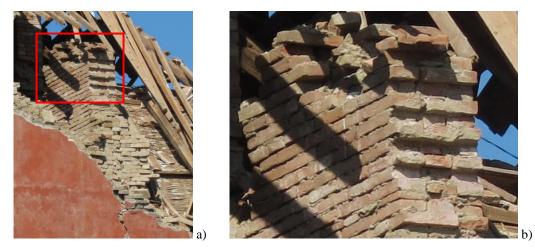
Example of regular triple header brick masonry bond in church I3, general view (a) and detail (b).
